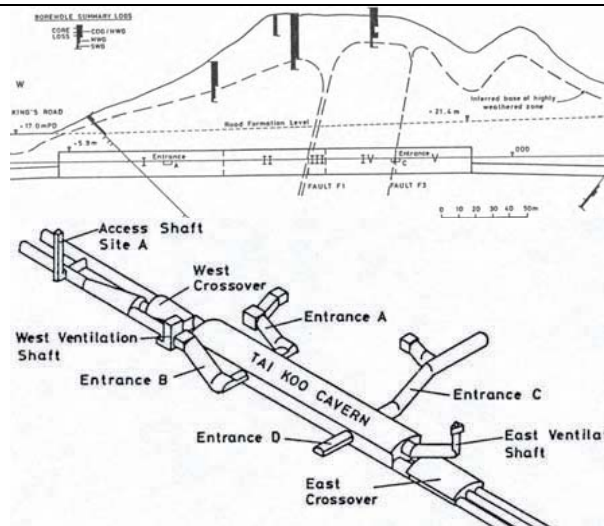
Longitudinal section and plan of Tai Koo MTR cavern showing zonation (I to V) based on rock mass characteristics (Sharp et al., 1986)
